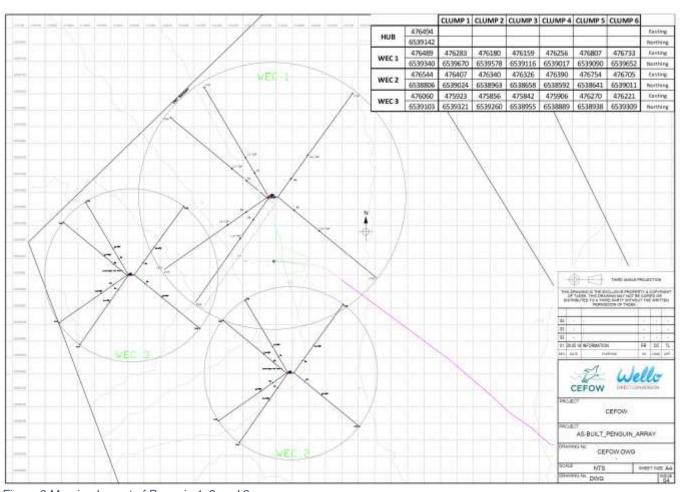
Mooring Layout of Penguin 1, 2 and 3
